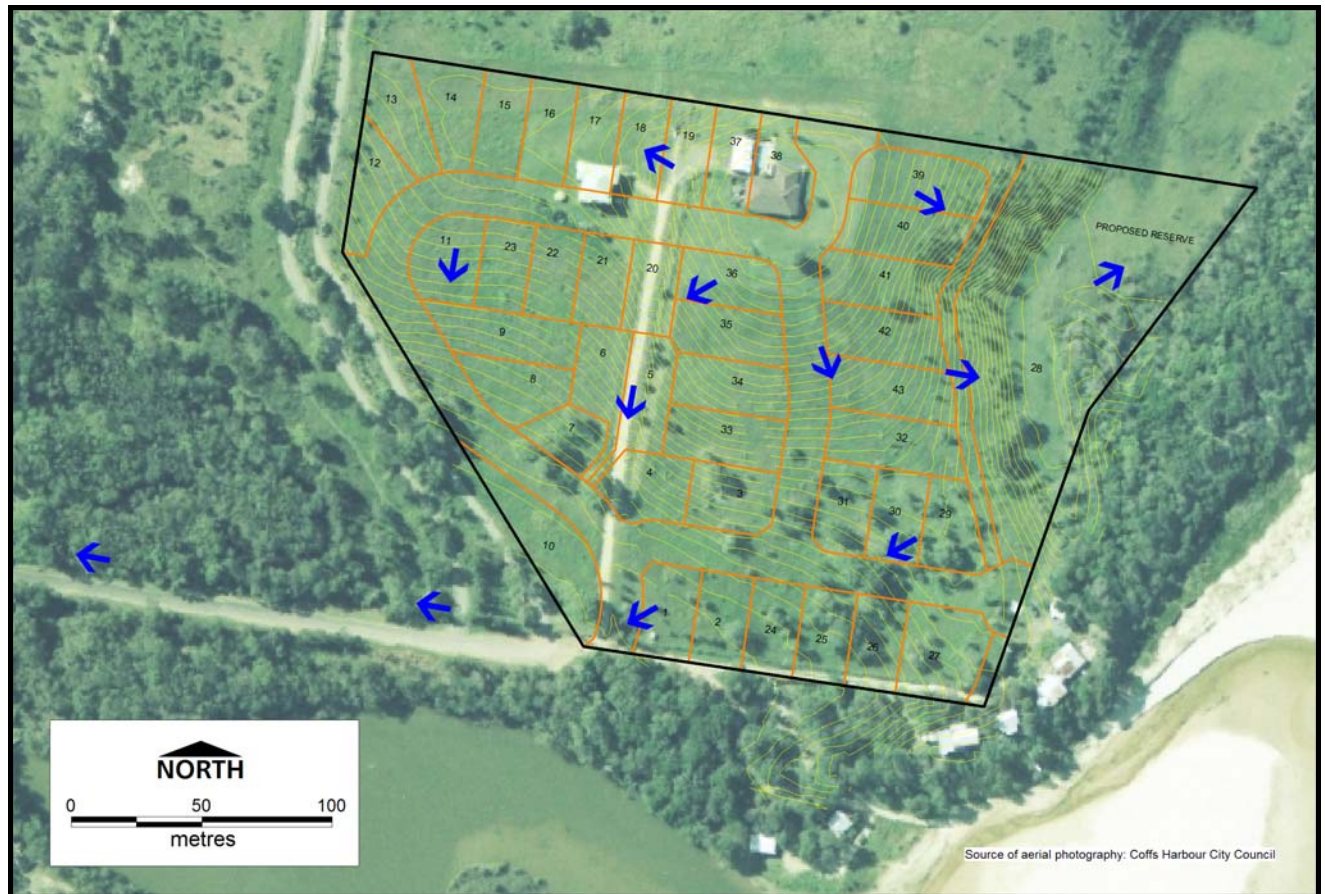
Existing site contours and drainage pathways (proposed layout shown for reference)
